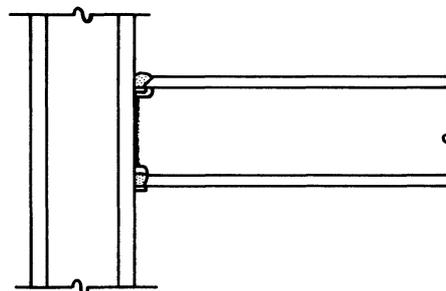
Web welds and the thick column flanges provide high restraint to the contraction of large flange welds. Large unit strains are forced to concentrate in column flange opposite beam flange welds.
